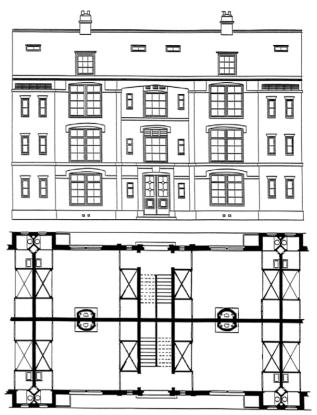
I. Wansinck, project of a building with one-room apartments, ± 1856
